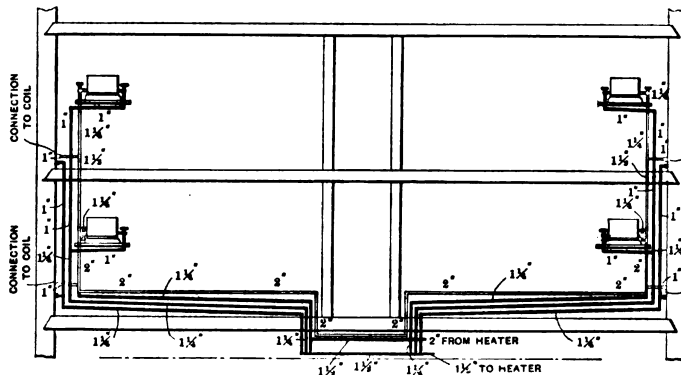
Partial Elevation on Line C D of Fig. 1, Showing Arrangement of Piping.
